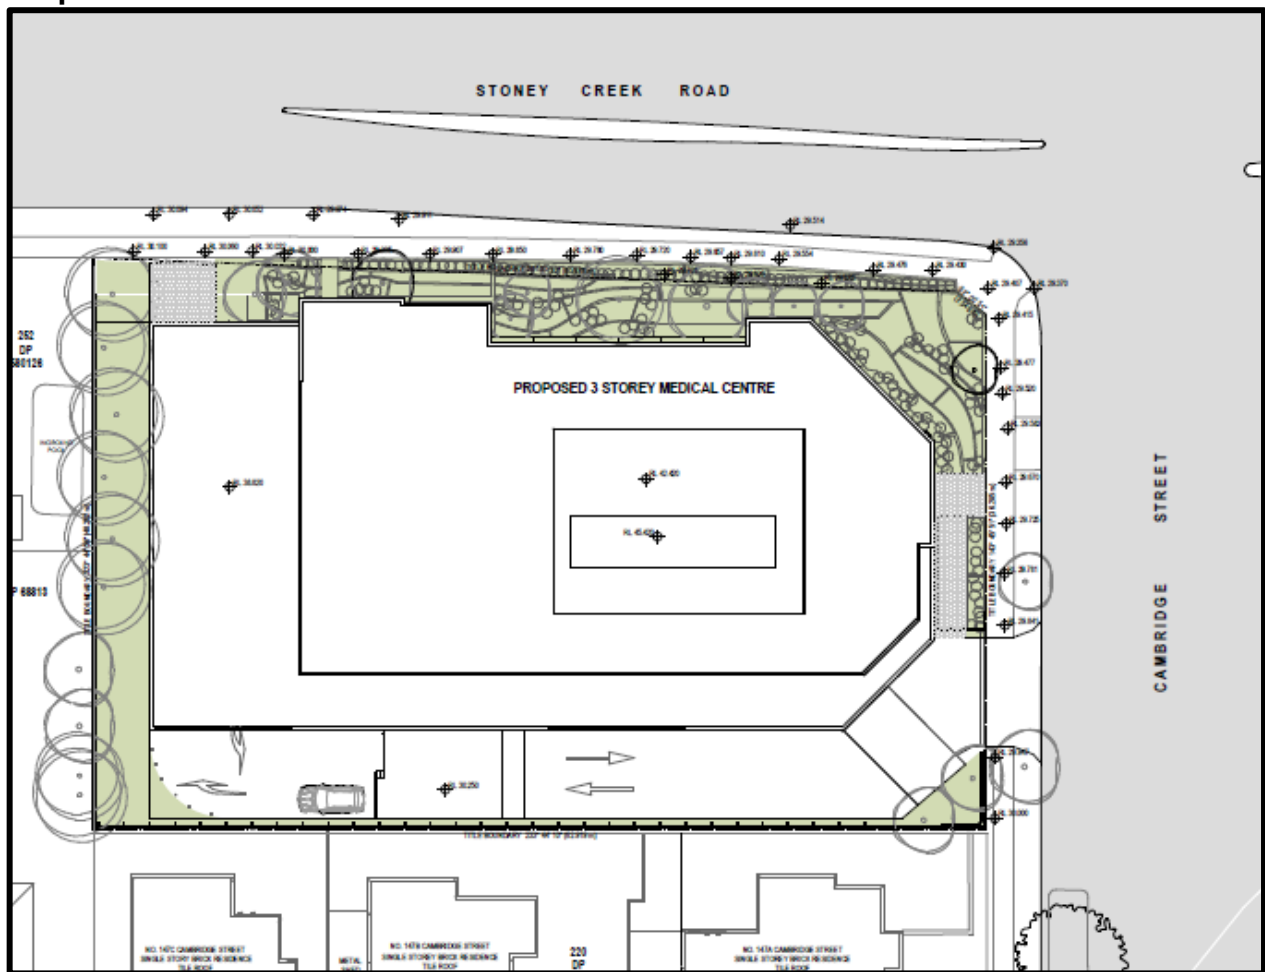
Proposed site plan (Source: Rothe Lowman Property Pty. Ltd. 2020)
